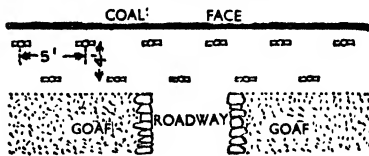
PLAN OF SYSTEMATIC TIMBERING
